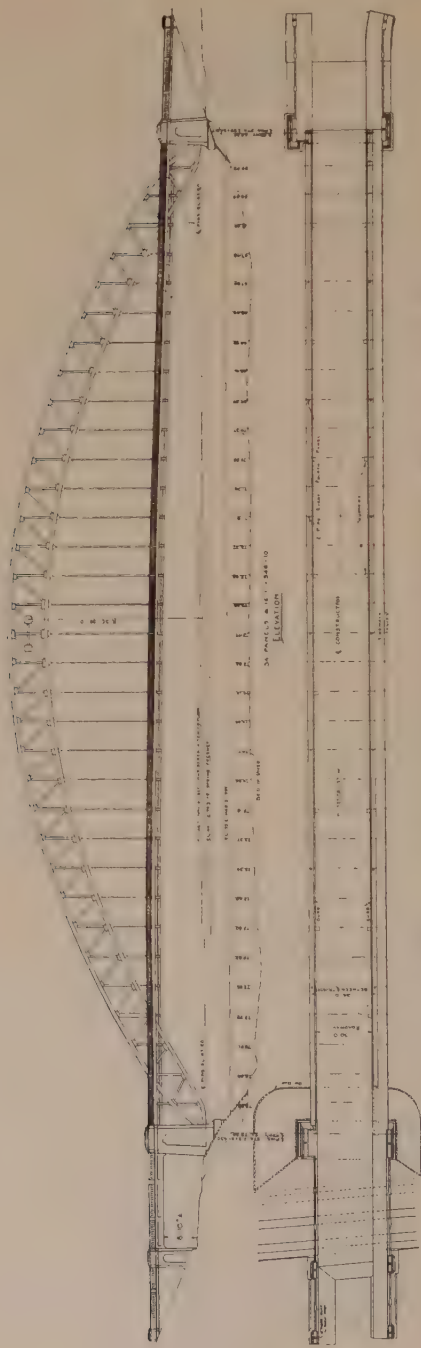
PLAN AND ELEVATION OF NEW TYNGSBOROUGH BRIDGE OVER MERRIMACK RIVER
